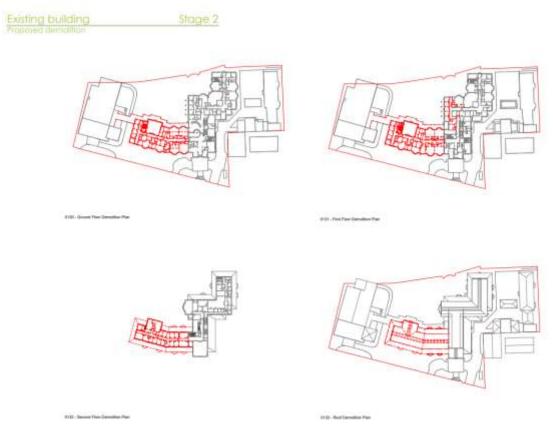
Proposed demolition plans, courtesy of Gilling Dod Architects
